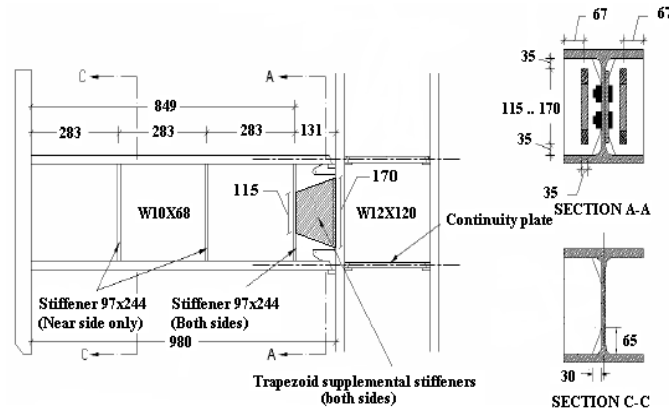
T-AISC-6 specimen-Overall layout (Dimensions in mm)
